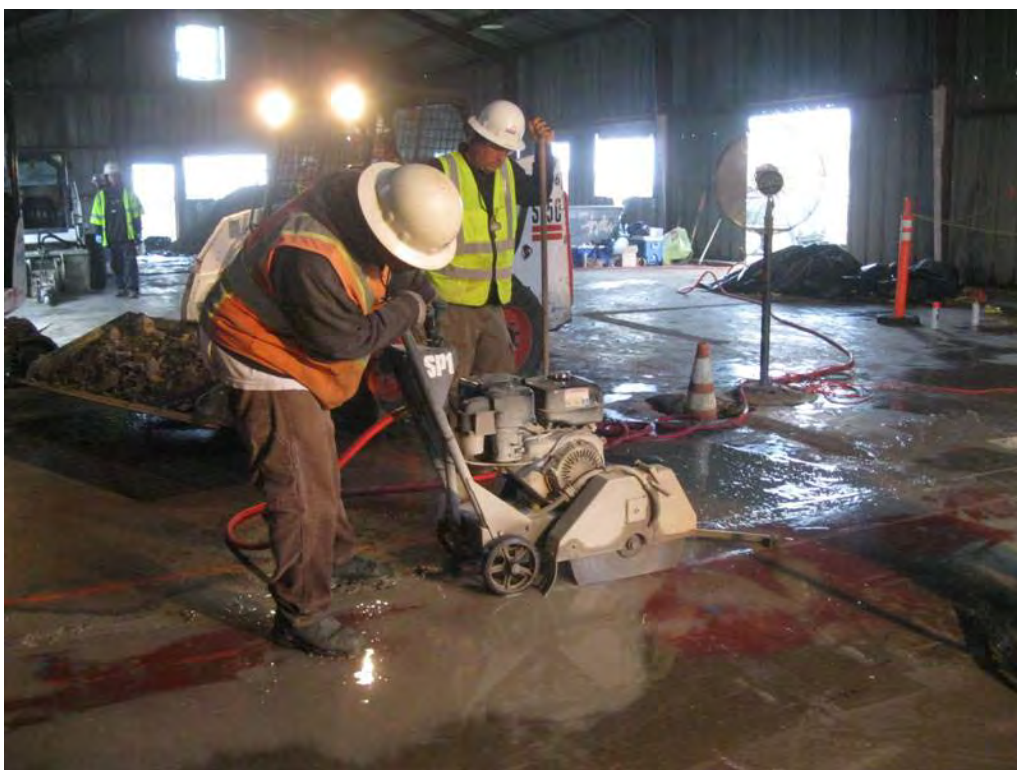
Saw-cutting concrete inside Building 274—March 12, 2012
